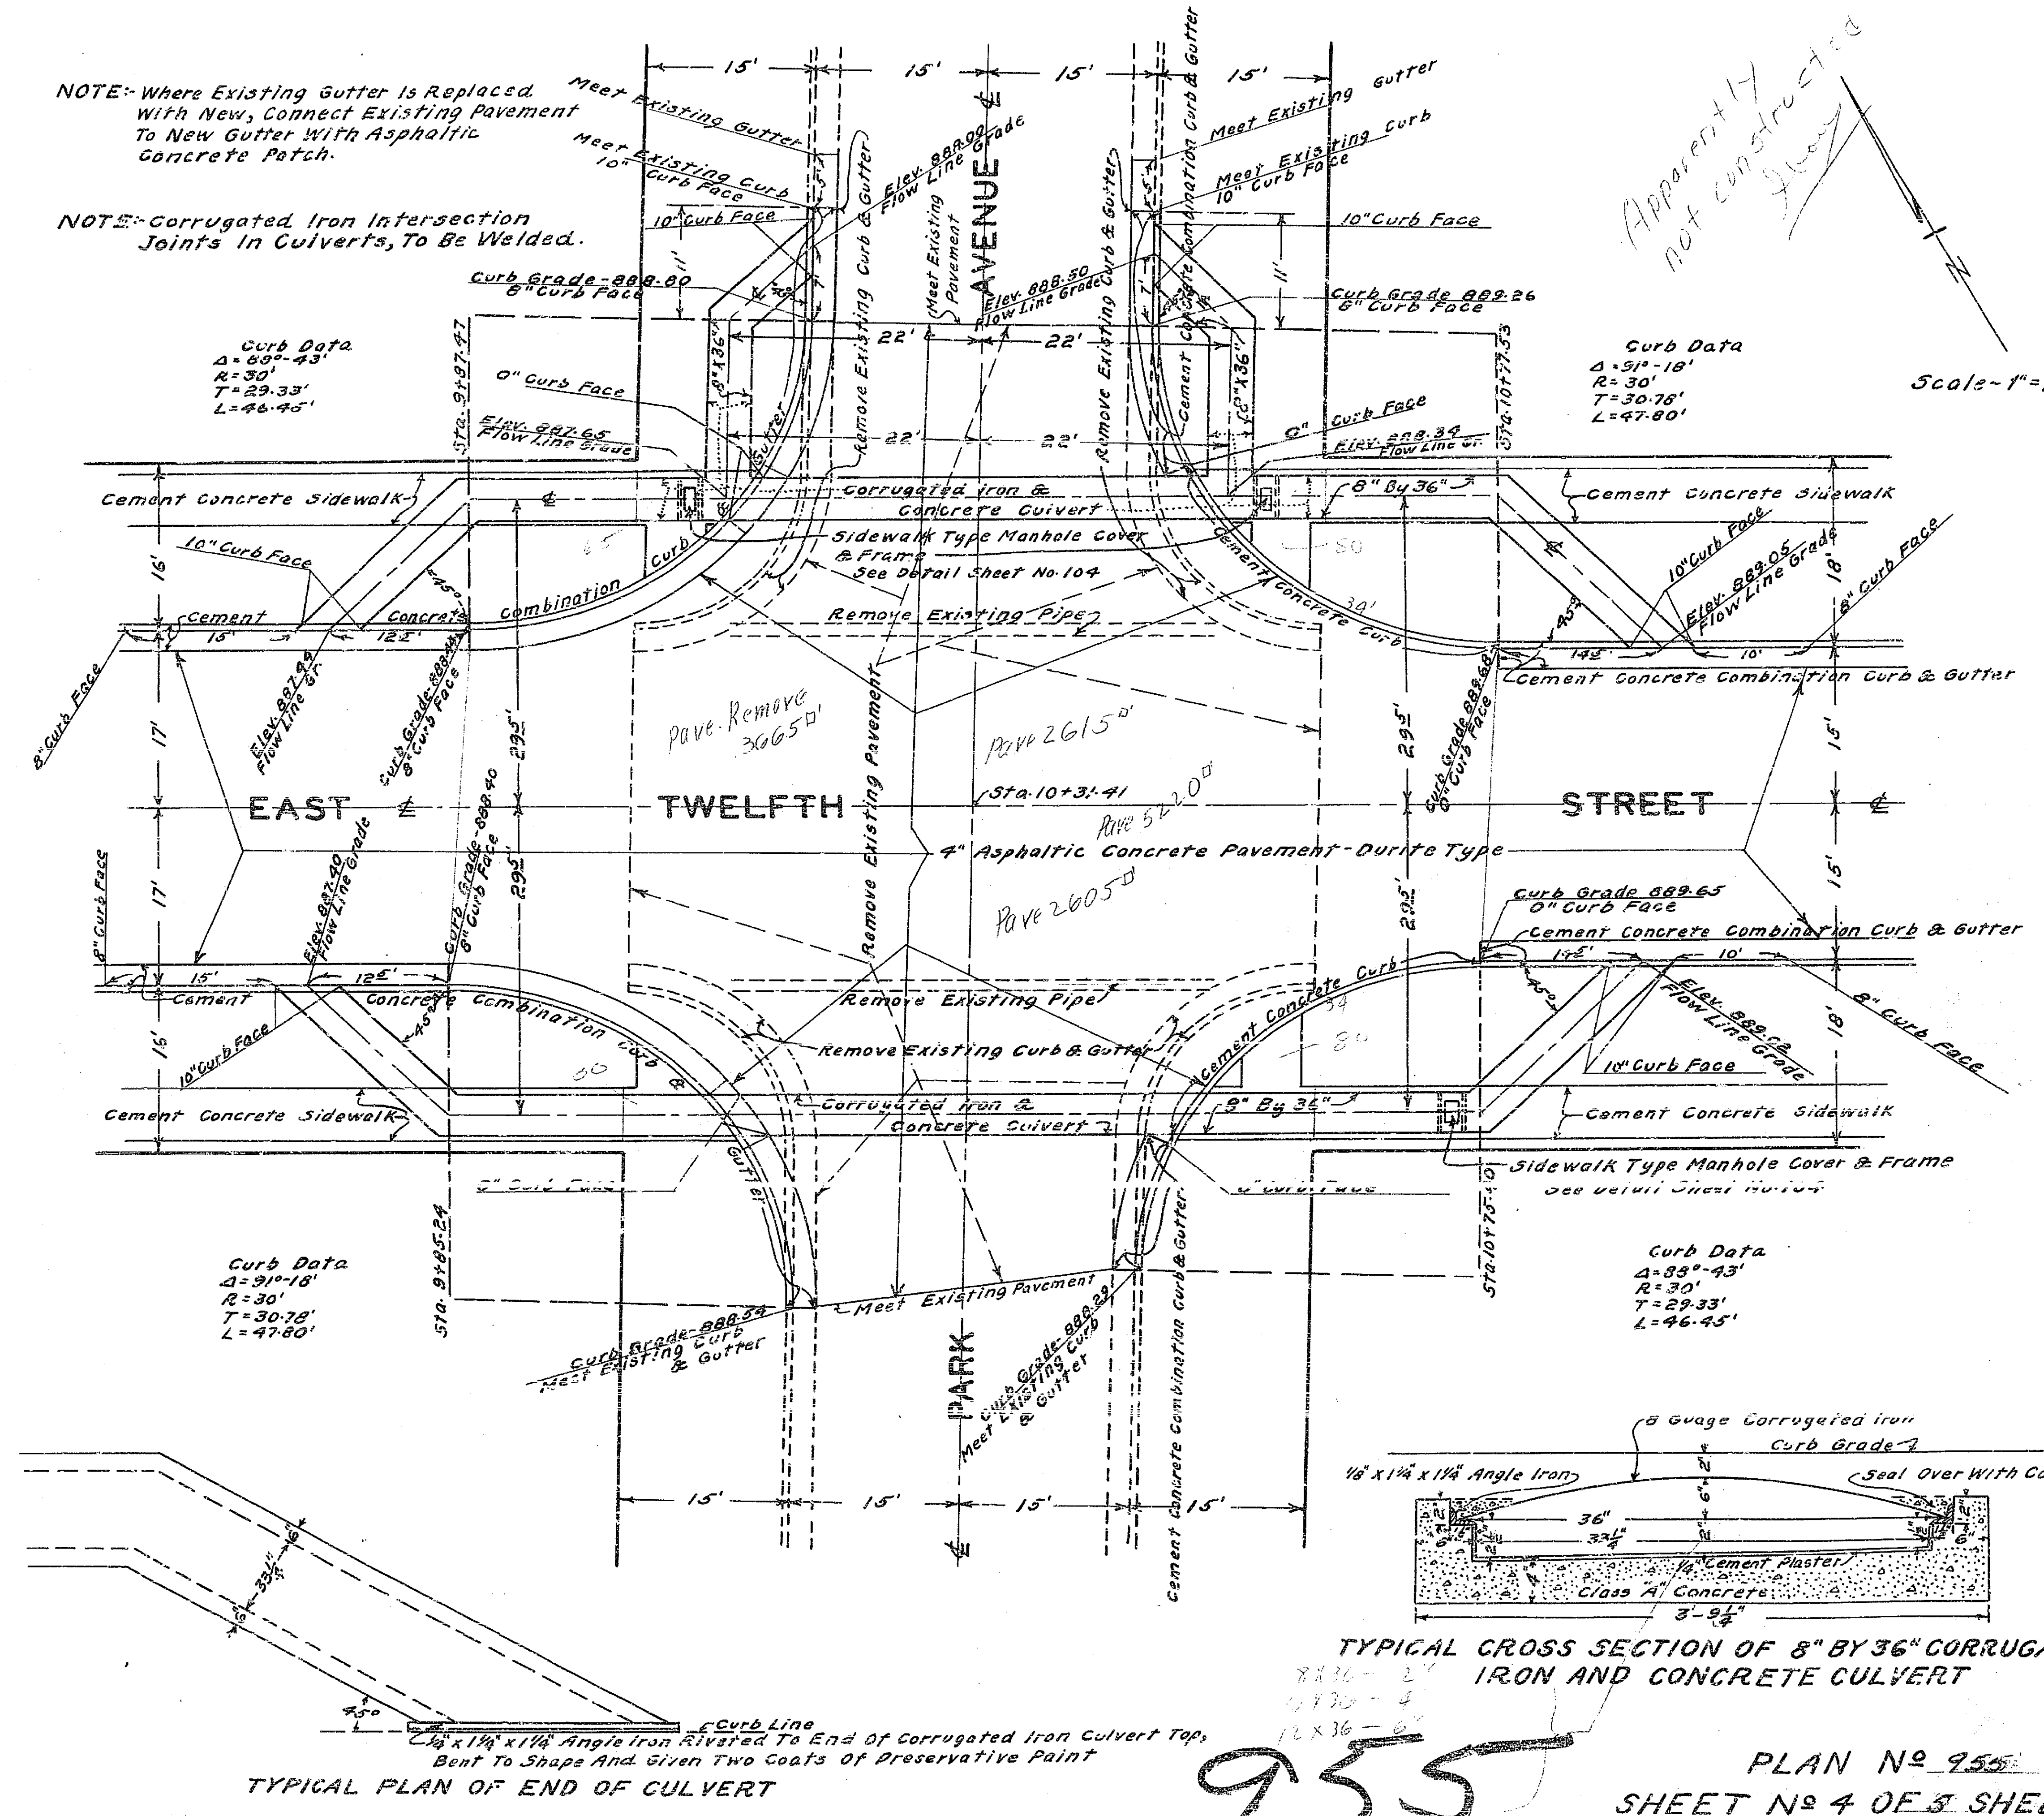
DETAILS OF INTERSECTION OF EAST TWELFTH STREET AND PARK AVENUE
